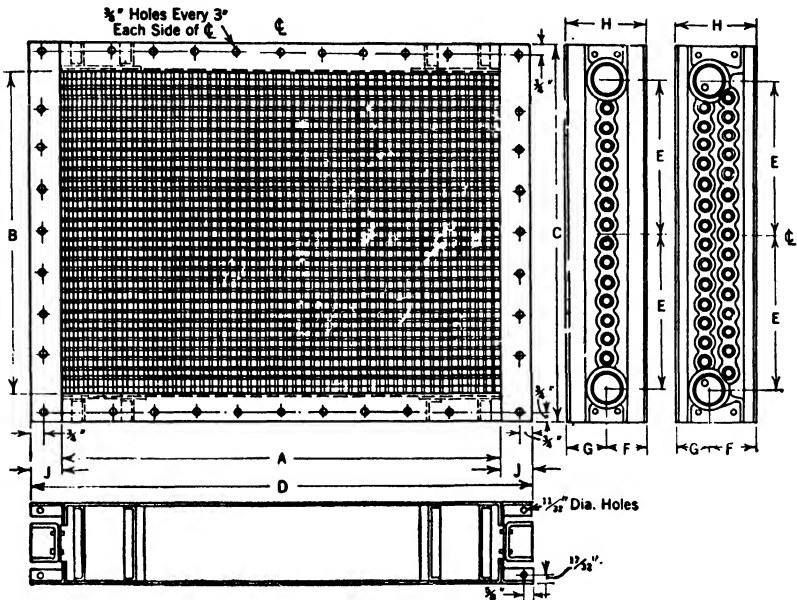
Dimensions of Trane Type-E Series 96 blast coils.
